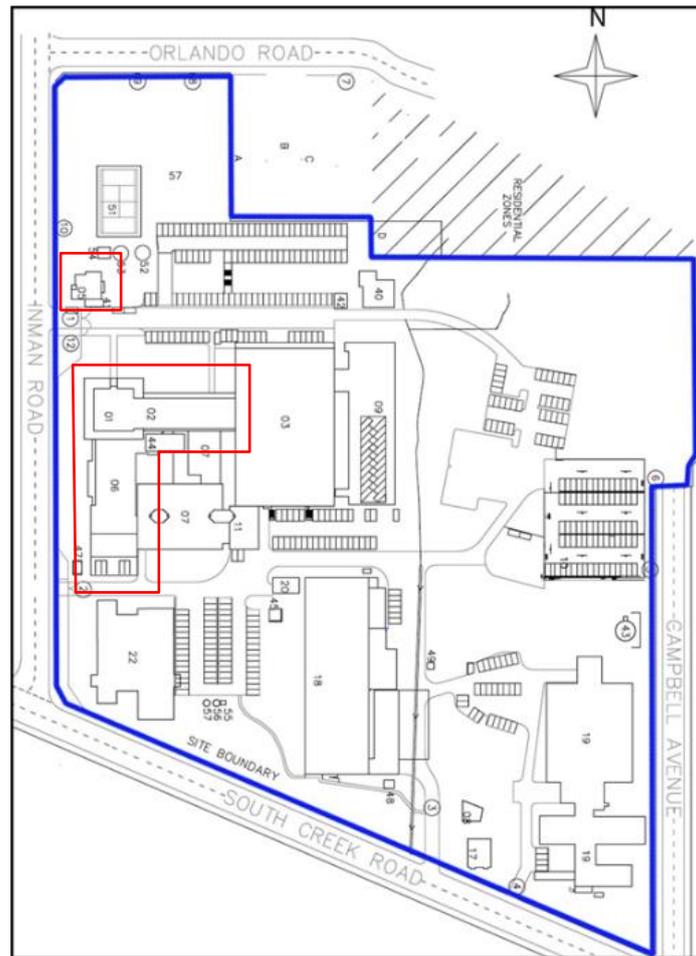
Existing Site Plan, identifying current building numbers. Buildings to be addressed in this report are outlined in red.
